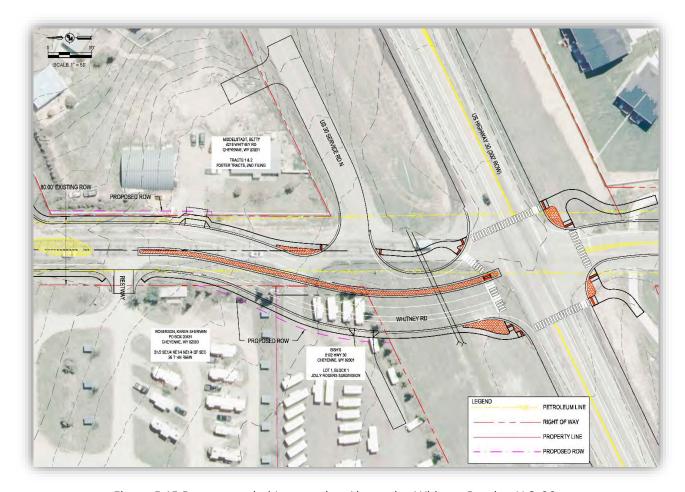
Recommended Intersection Alternative Whitney Road at U.S. 30
